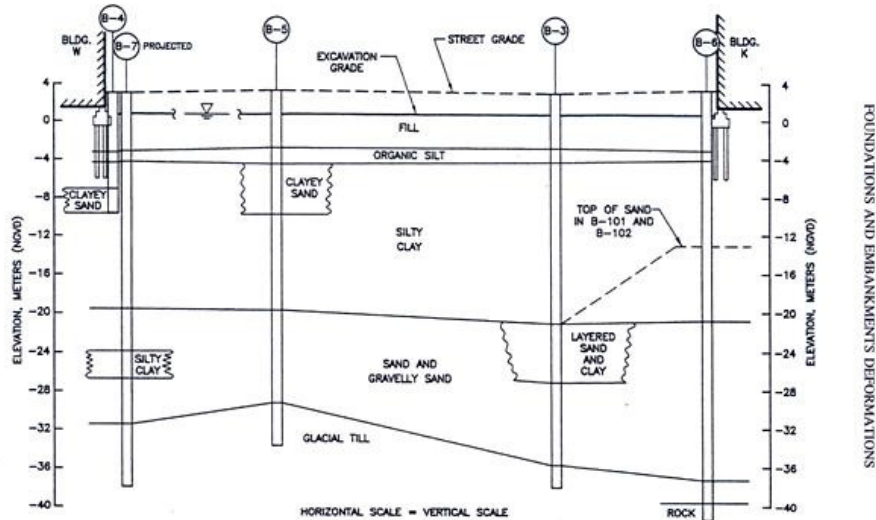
Subsurface profile through a site in Back Bay of Boston, Massachusetts (Leathers, 1994).
